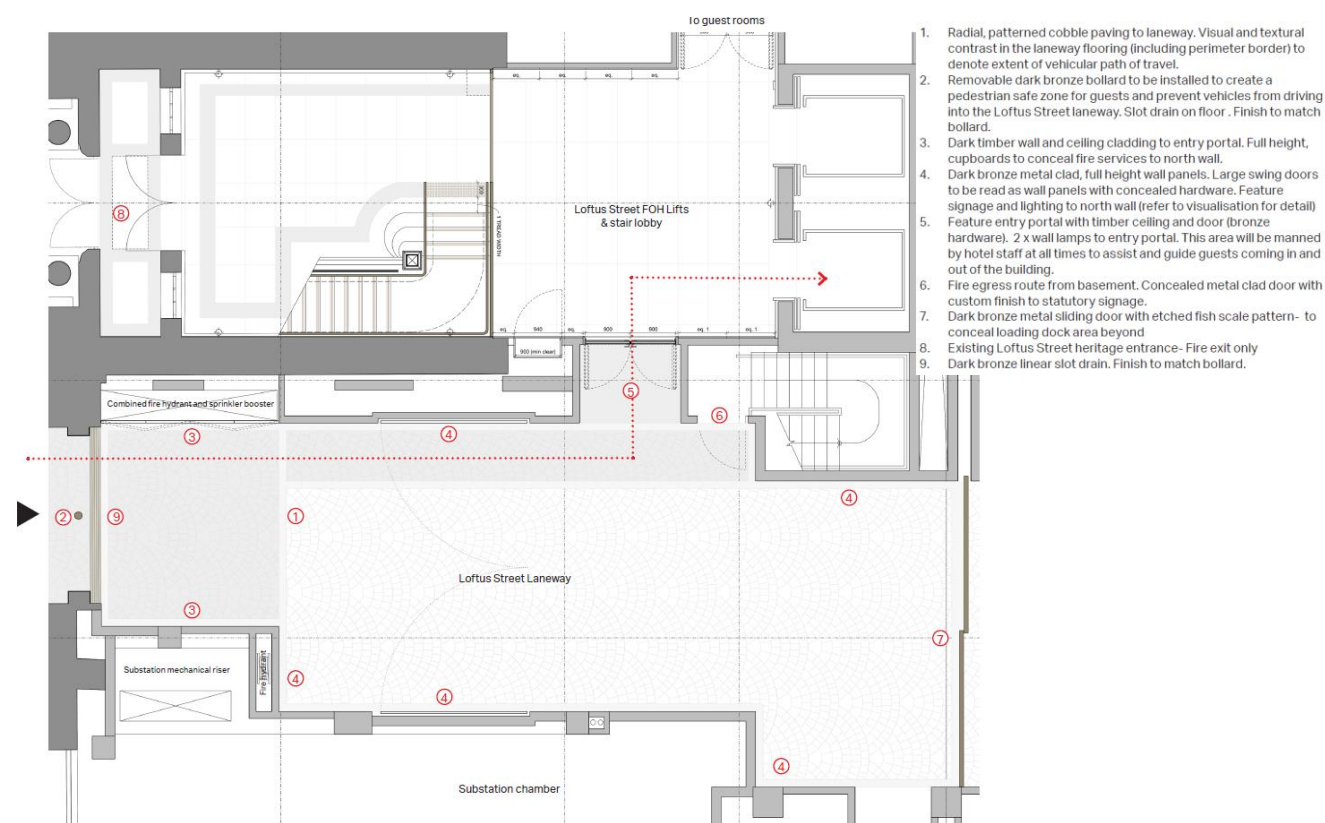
The proposed Loftus Street Laneway entry for accessibility entry
